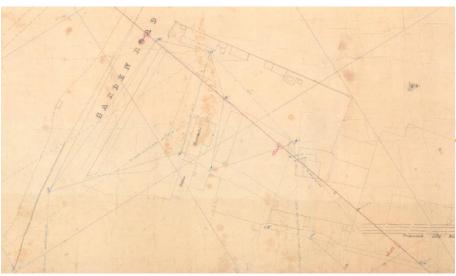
Plan of the Bondi Outfall Sewer showing the Police Barracks. Source: Sydney Water.
